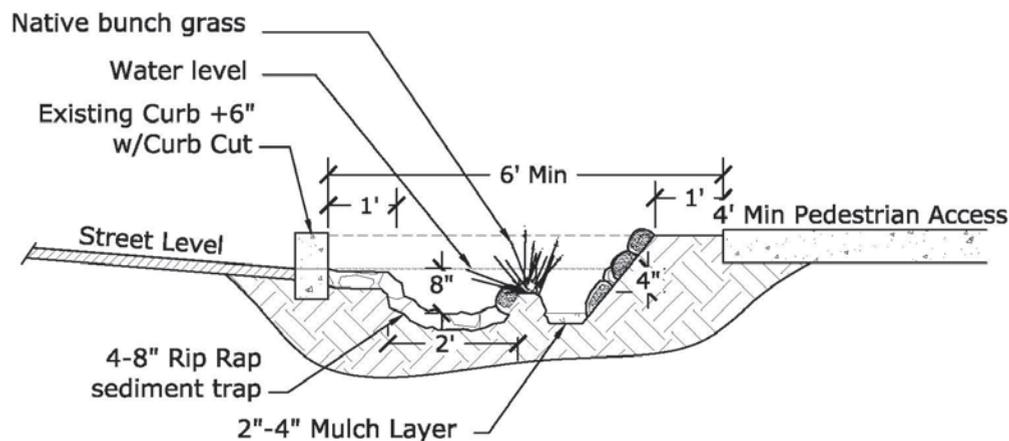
Typical cross section of sediment trap for curb cut with rock-lined basin.
